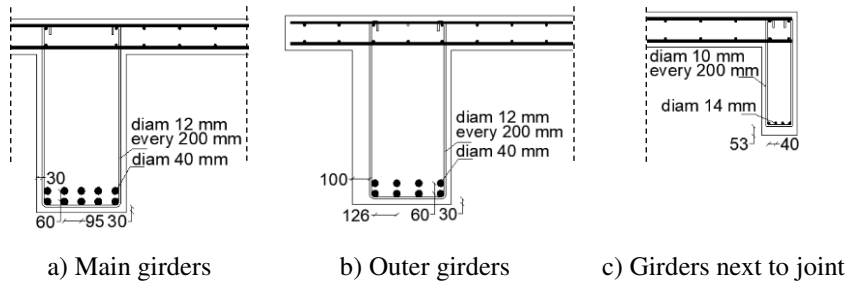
Reinforcement layout of the longitudinal girders (dimensions in mm)
